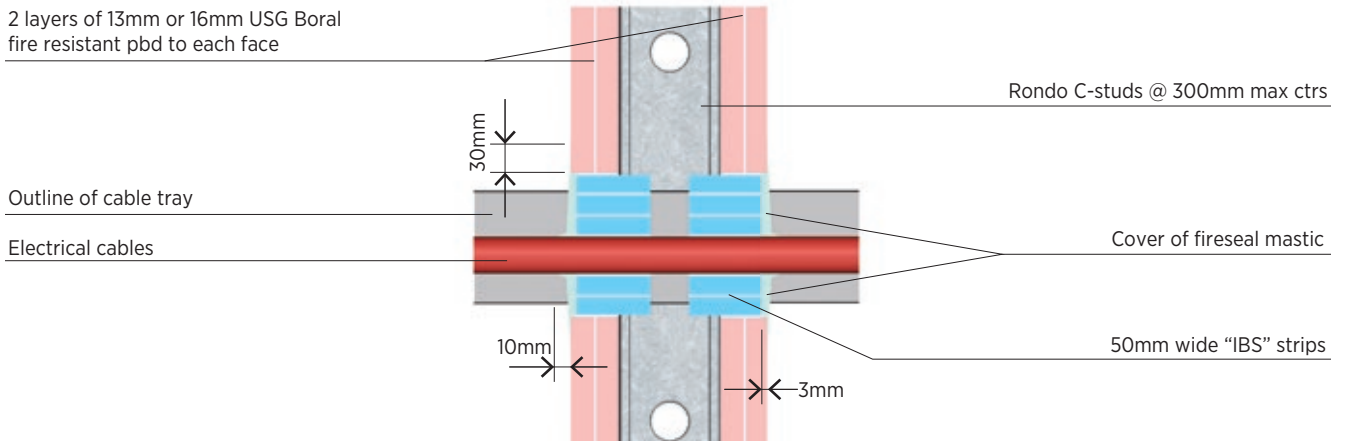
Penetration Detail – Cable Tray – Section Through Wall
